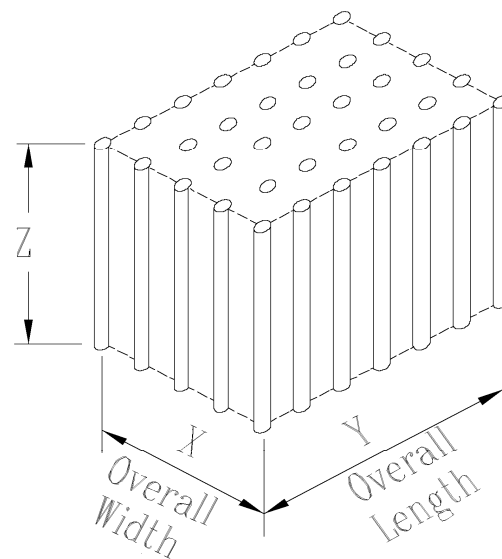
Pile Group Acting as a Block Foundation
